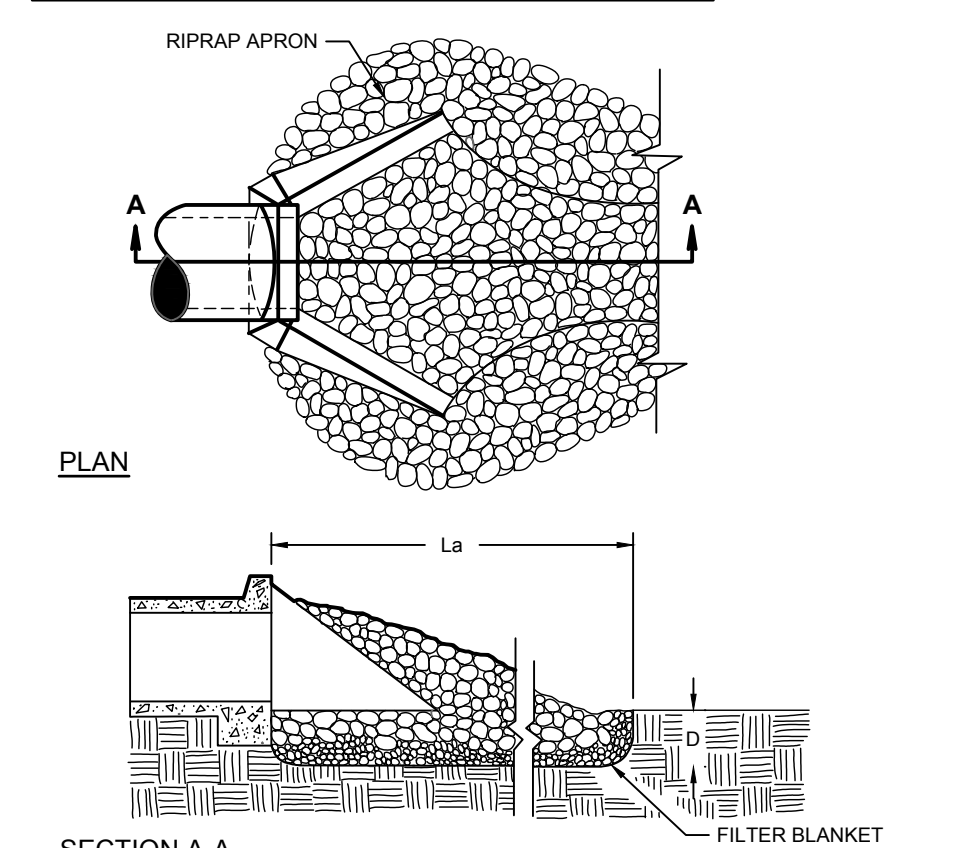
RIPRAP OUTLET PROTECTION (MODIFIED FROM VA SWCC)
